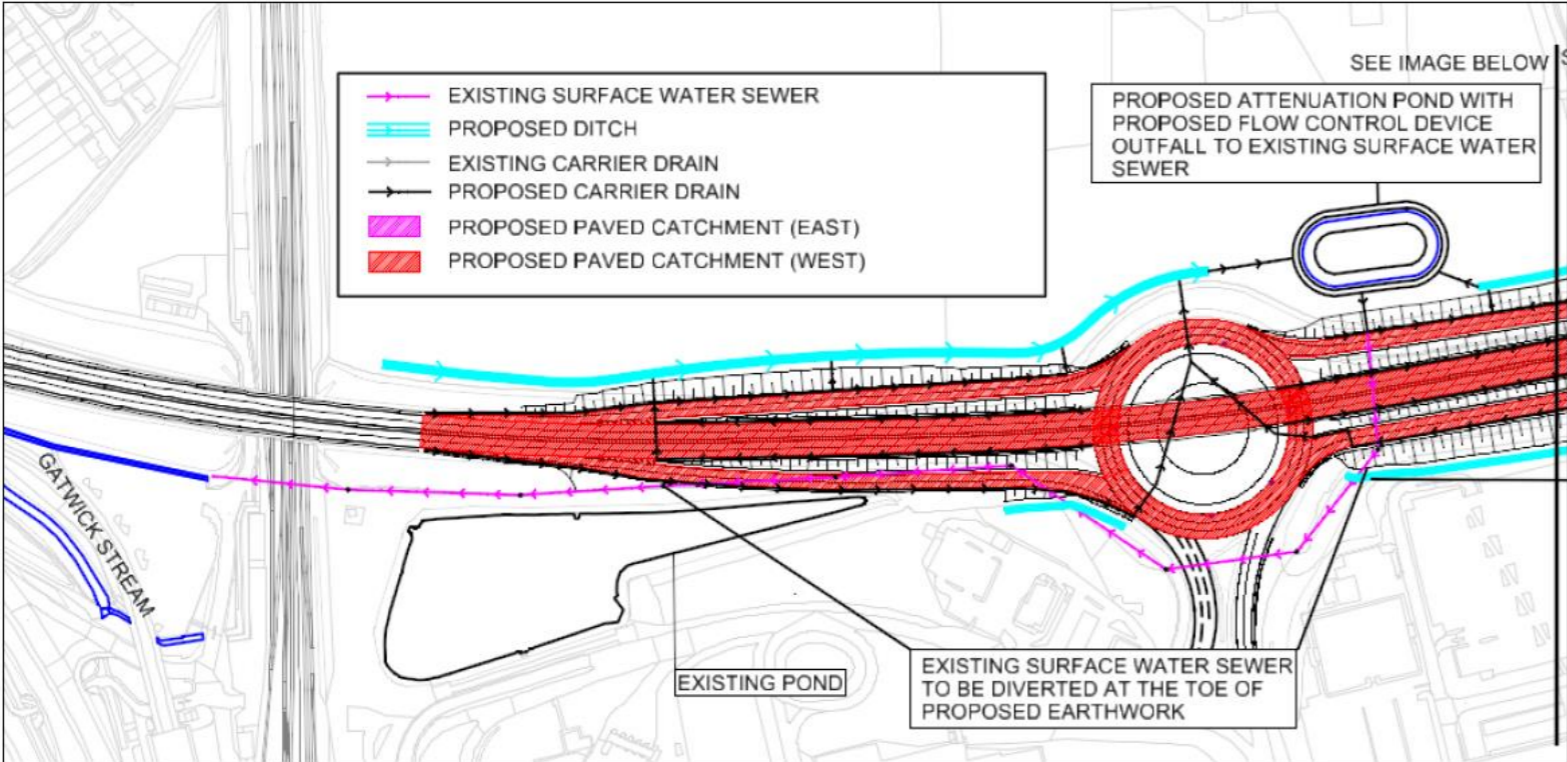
Indicative North Terminal Roundabout Drainage Layout
